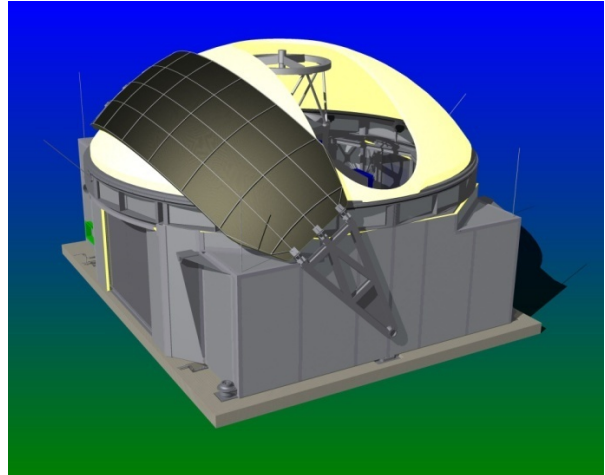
CAD drawing of the enclosure at the final design review. Picture courtesy of EIE.
